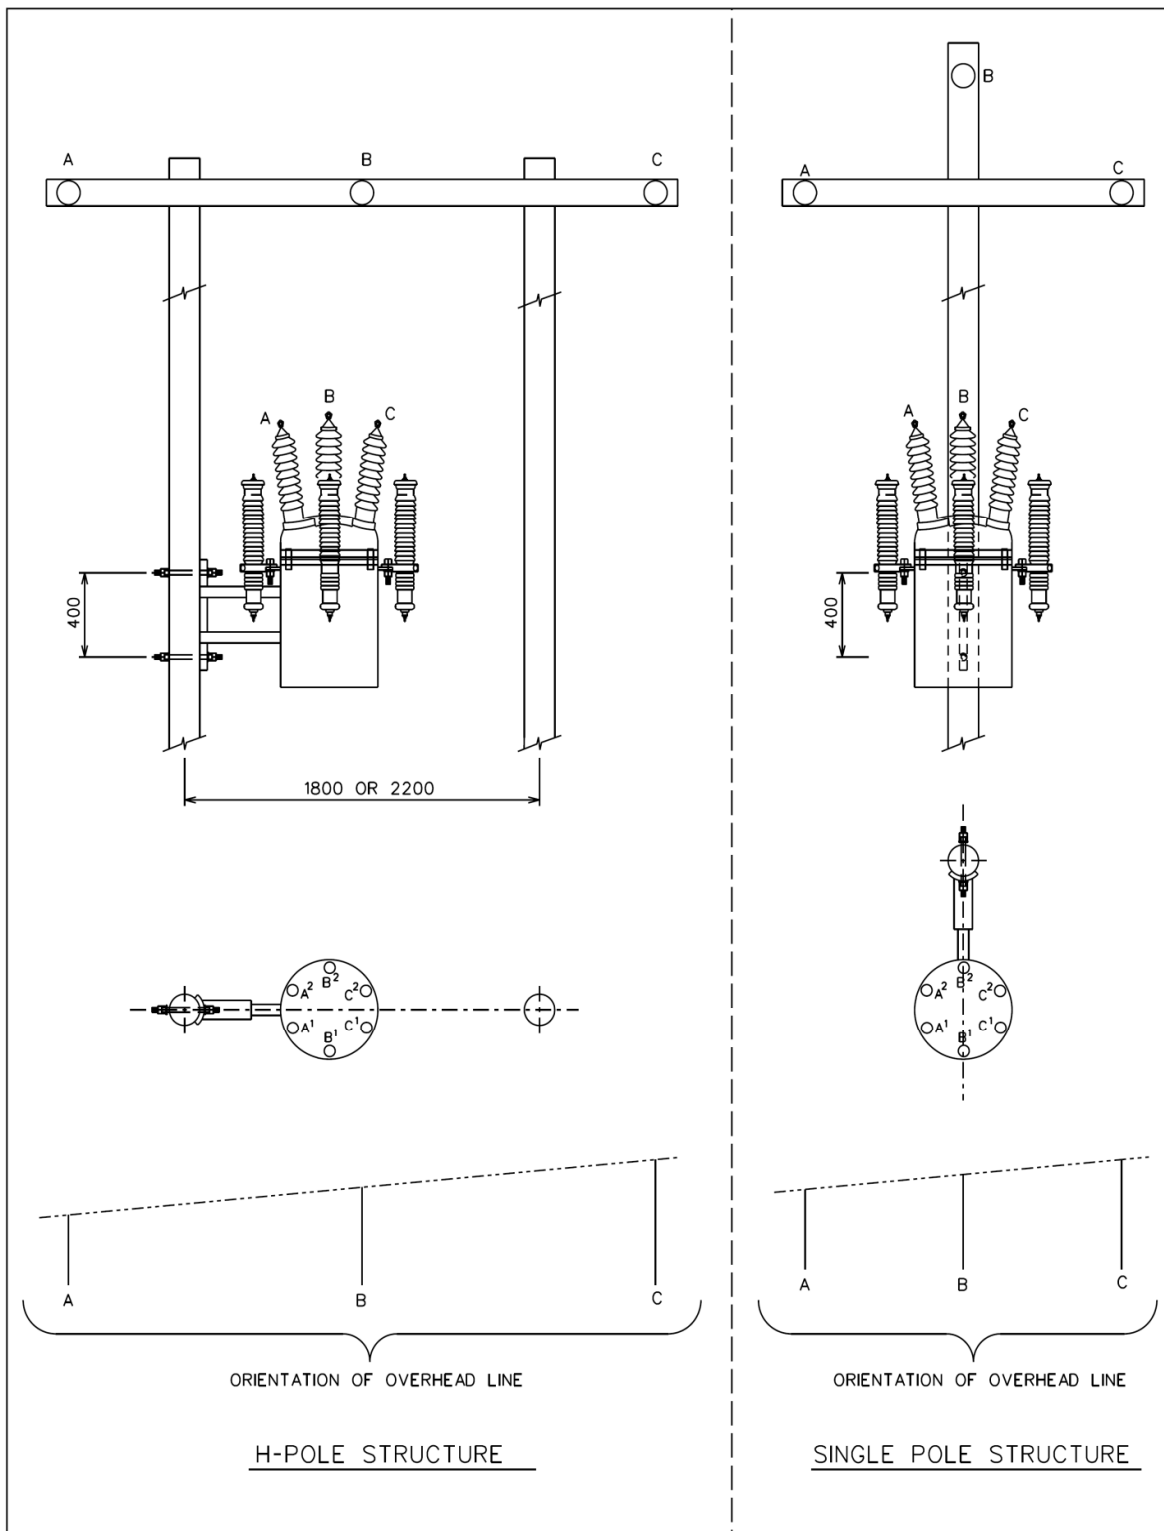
Critical mounting dimensions and illustration of universal mounting bracket.
